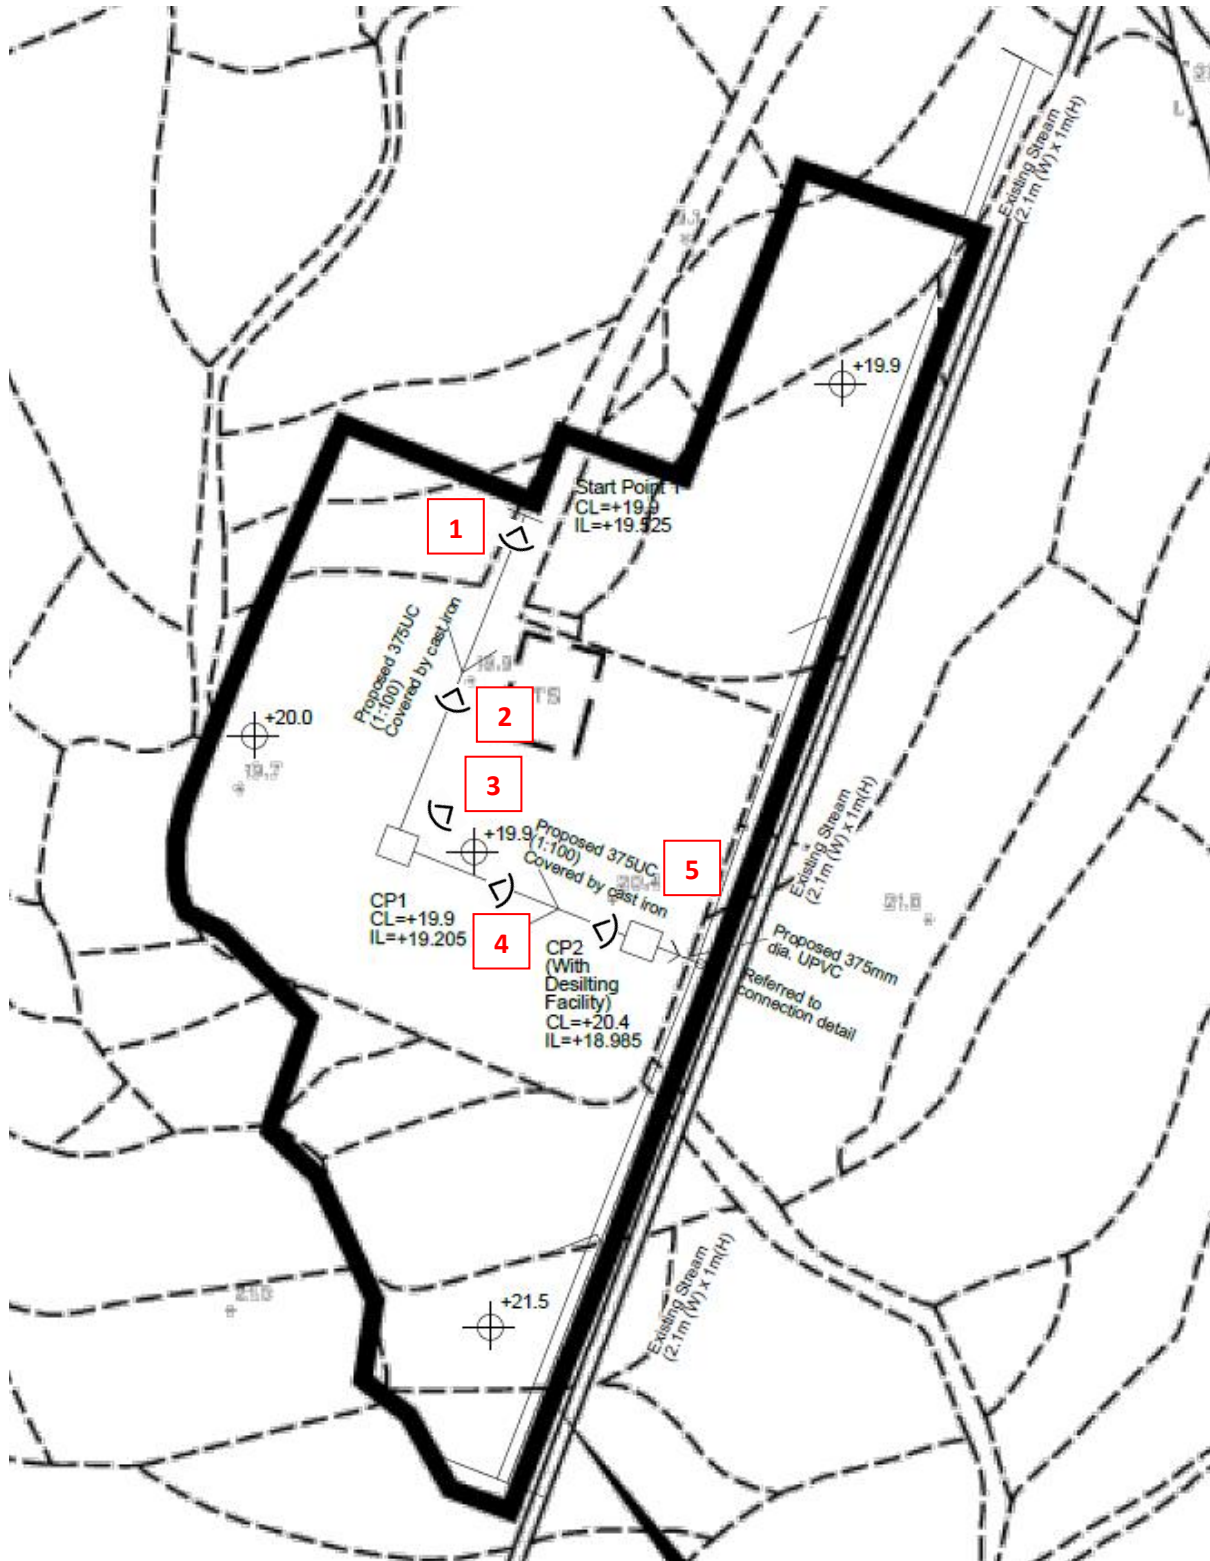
Drainage proposal accepted under previous application No. A/YL-SK/261
